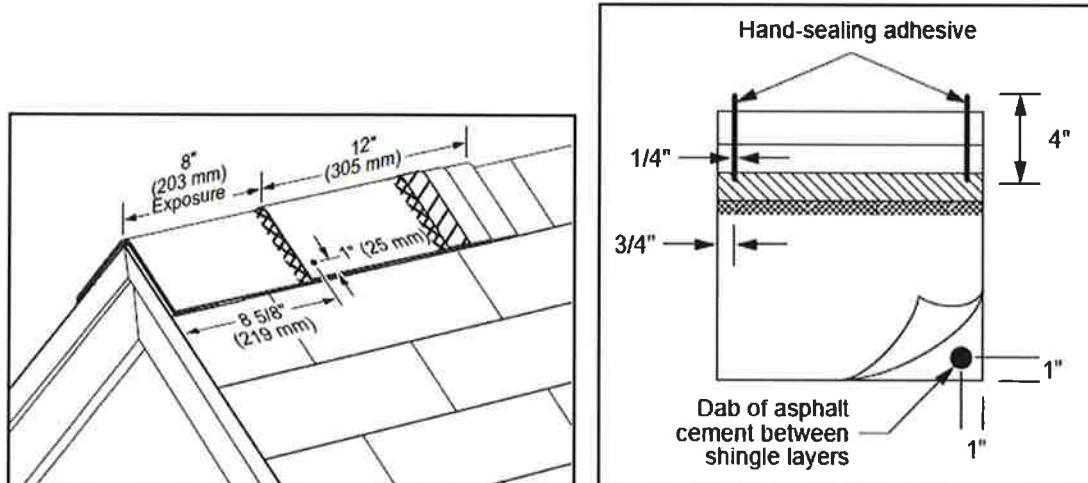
Use six nails and four spots of asphalt roofing cement on steep slopes.
